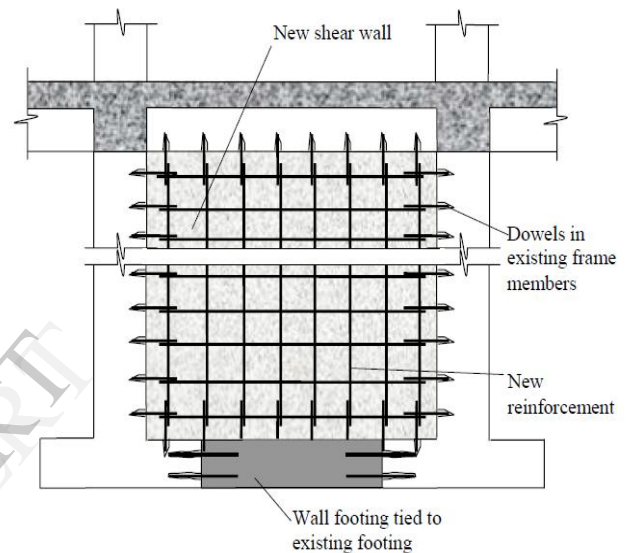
Addition of a shear wall (Courtesy: FEMA 172)
